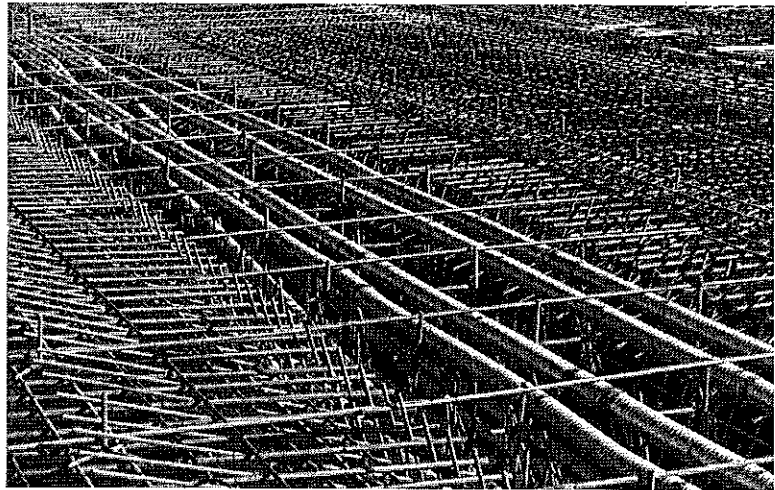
Welded wire fabric is used to reinforce concrete slabs.
